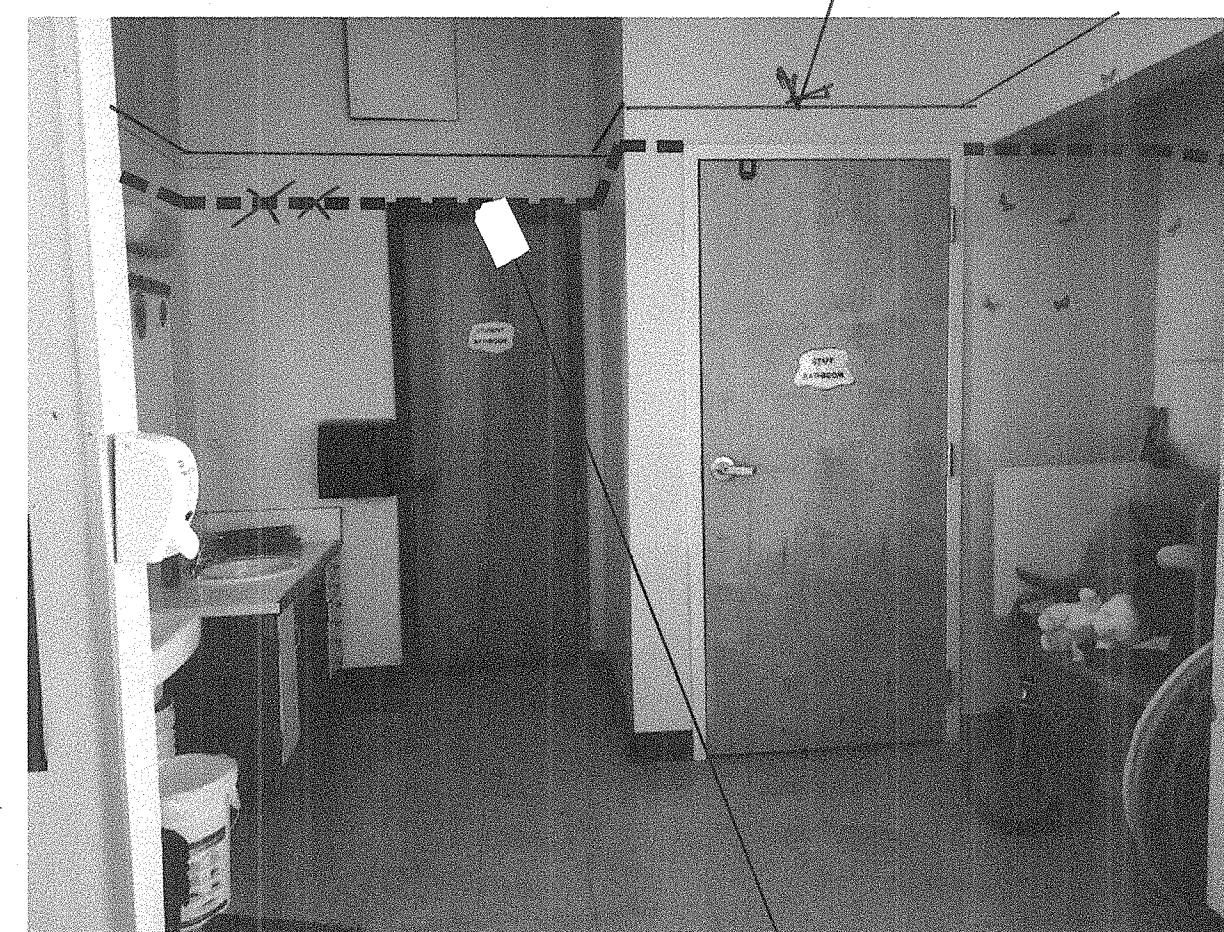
PHOTO C - EXISTING CONDITION AT ACCESSIBLE RESTROOM
